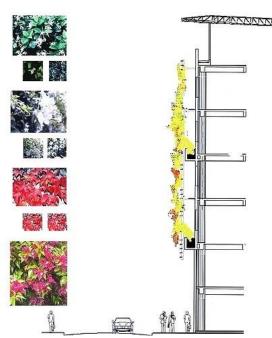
Detail of wall section also showing the structural connections between plant stand, planter and building (Pastorelli, 2009).
